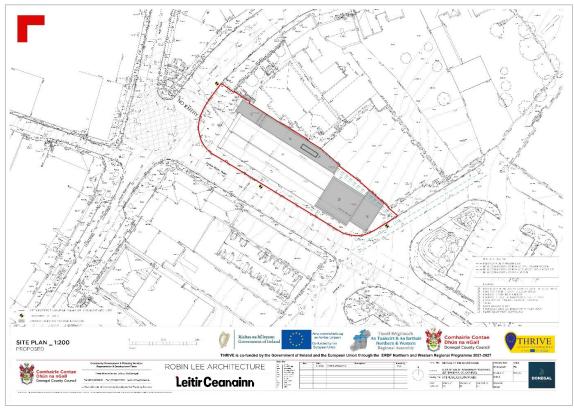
Proposed Site Layout Plan (published 20th March 2025)
